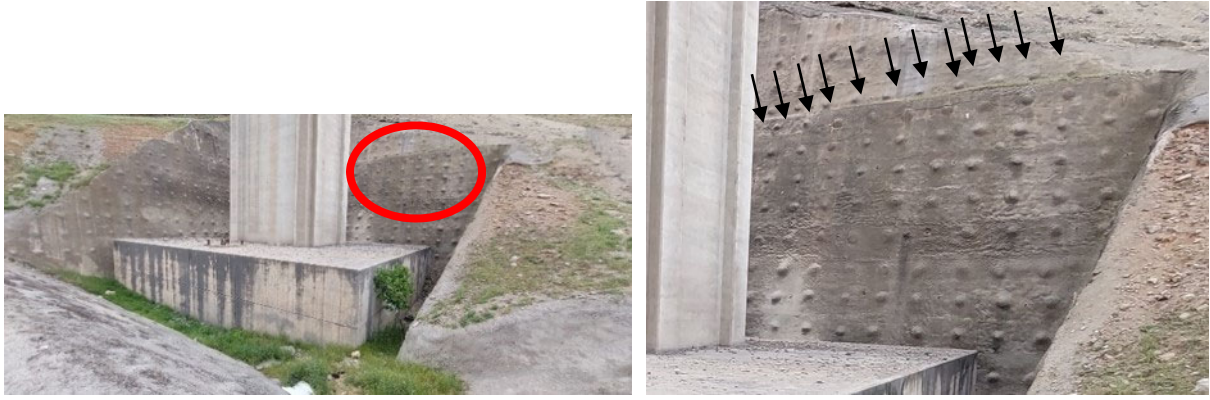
Damage to retaining wall surrounding the pier: (a) View of the bridge pier with minor cracks on the wall and (b) Enlarged view
